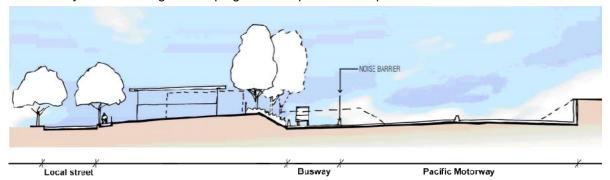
Typical cross-section through Precinct 1 — Strategy 3
